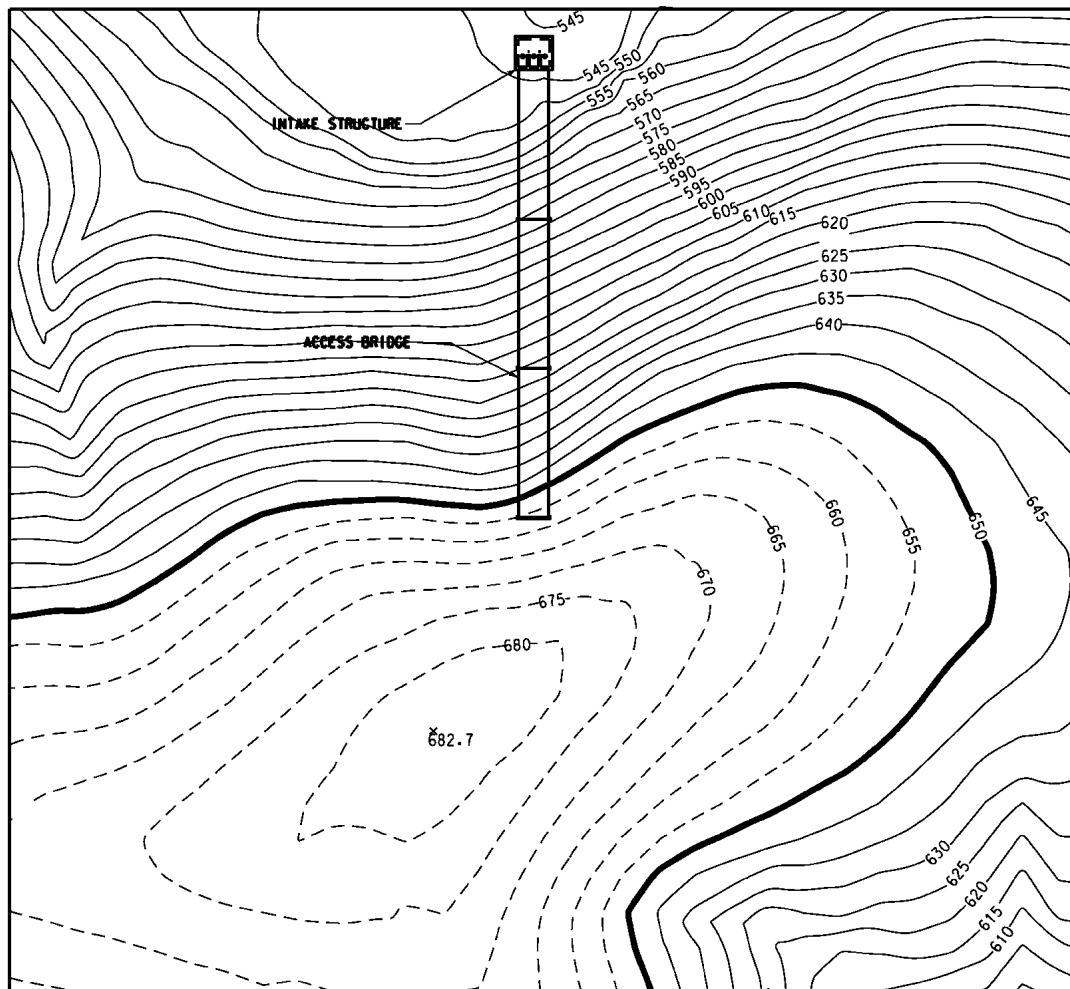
Planned Configuration of the Make-Up Pond C Intake Structure and Access Bridge (Duke 2012h)
